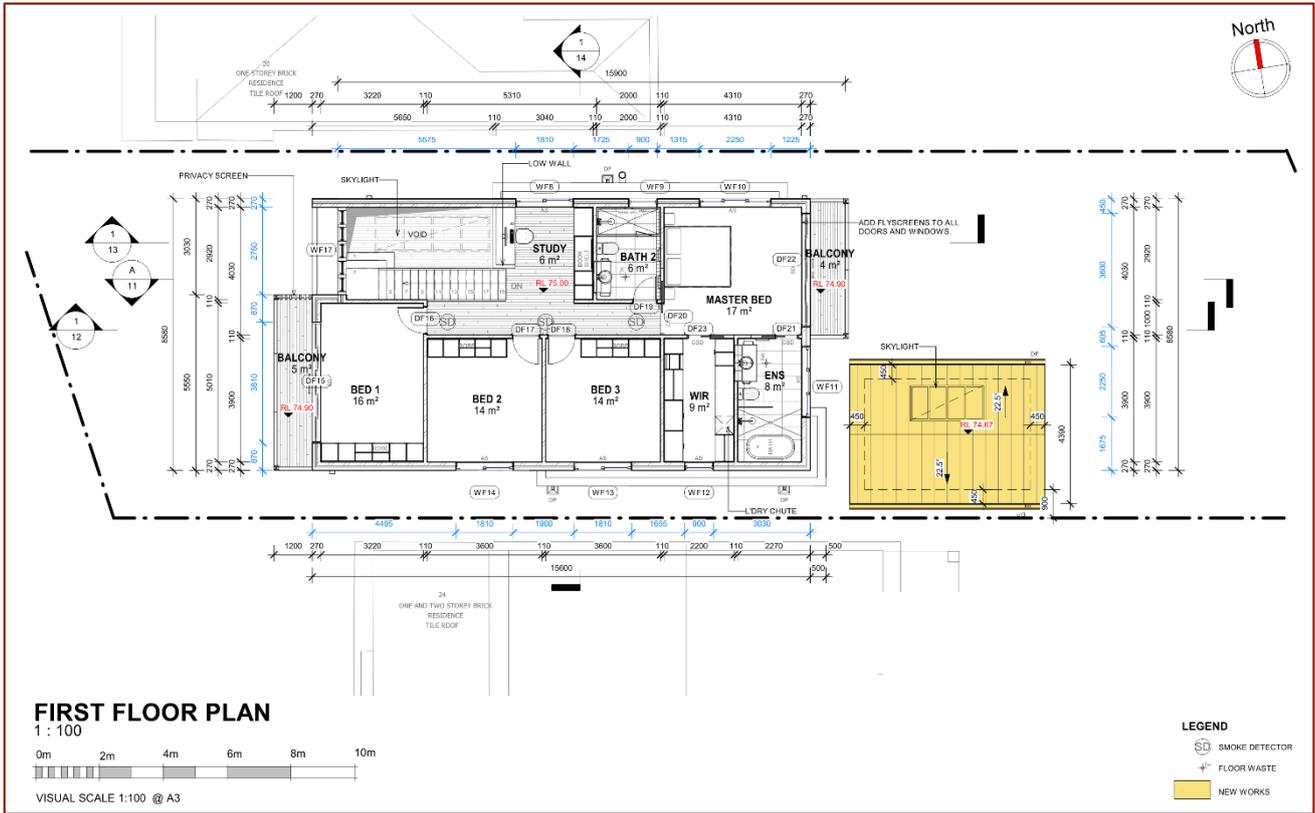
BASIX sample Detached dwelling First Floor Plan
